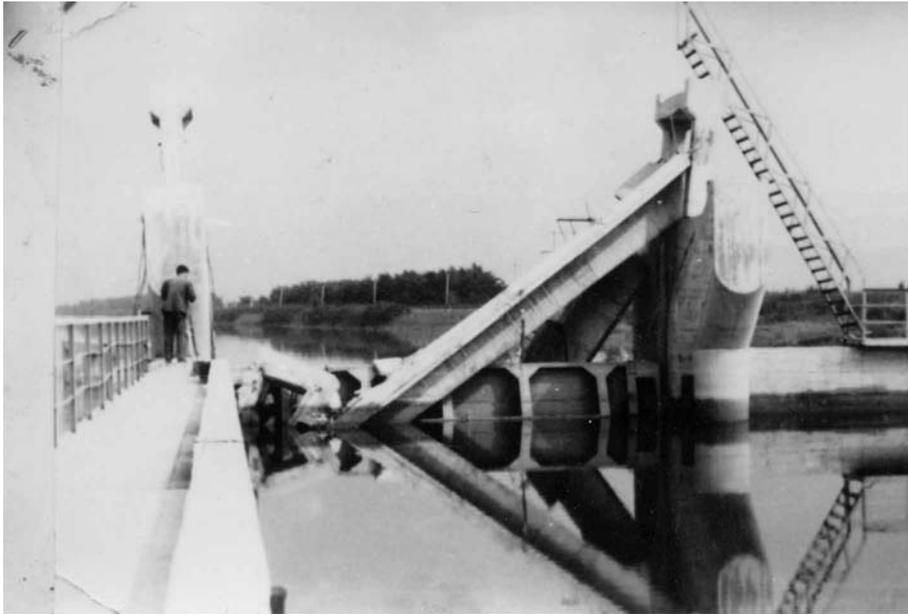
The upper lock head of the Peizhuang shiplock collapsed.
